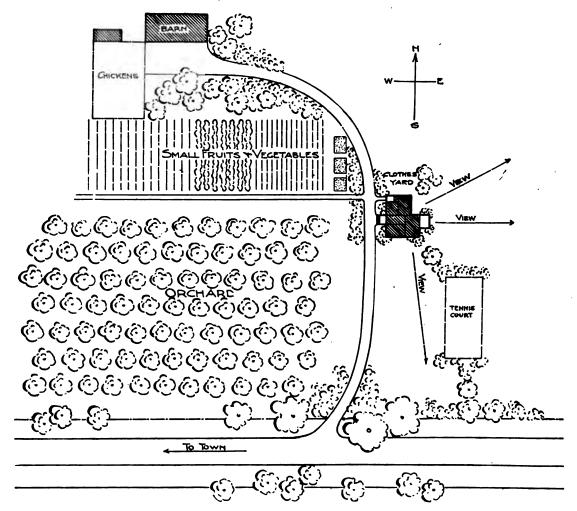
SUGGESTED ARRANGEMENT OF A FARM HOUSE, BUILDINGS AND GROUNDS FOR A SOUTH FRONT.
